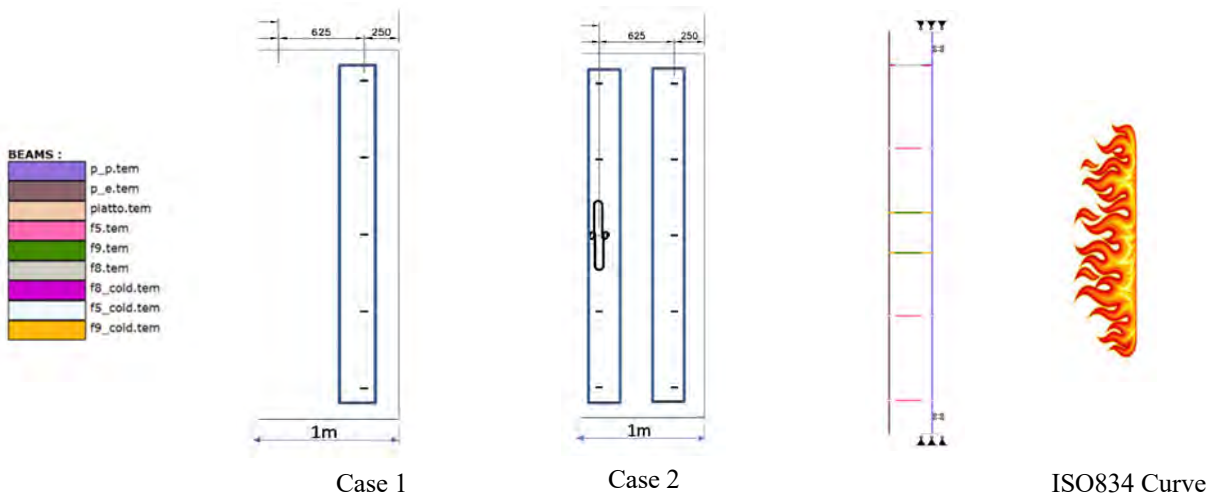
Minimum reinforcement used the 1m band with wall constraints are hinged
